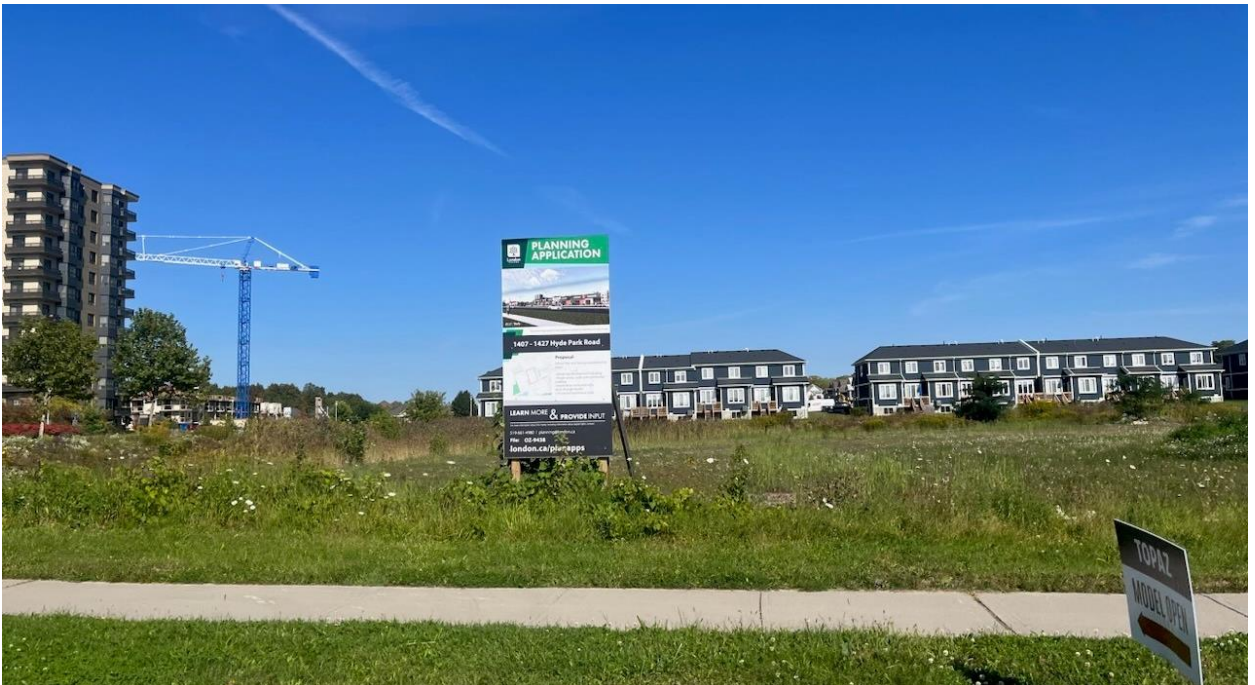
Streetview of 1407-1427 Hyde Park Road (view looking E)
